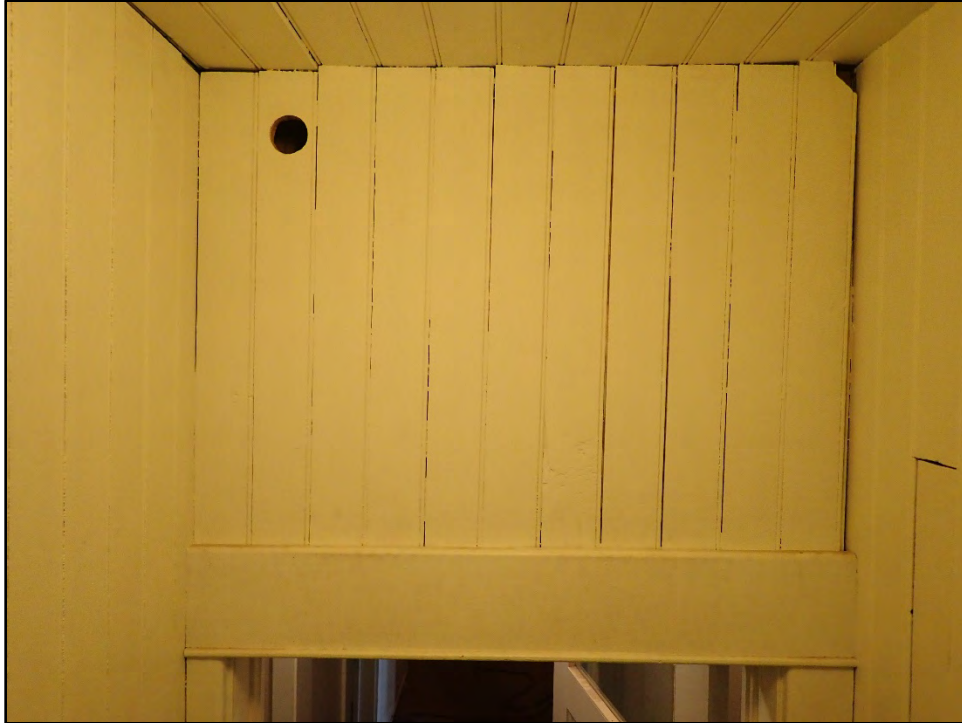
A view back down the staircase and into the hallway to the bedrooms.
